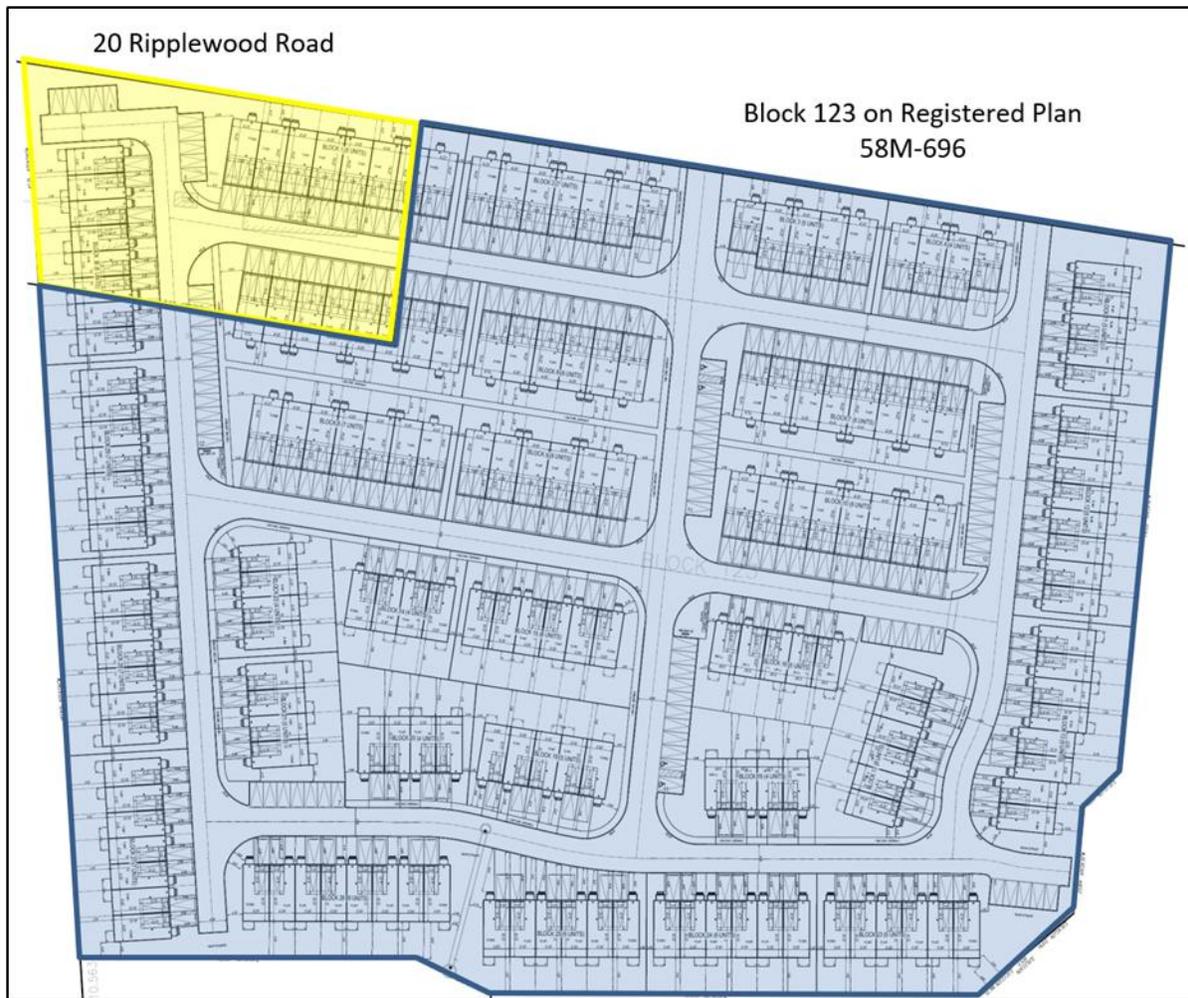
Proposed Conceptual Site Plan of the Overall Condominium Cluster Townhouse Development
